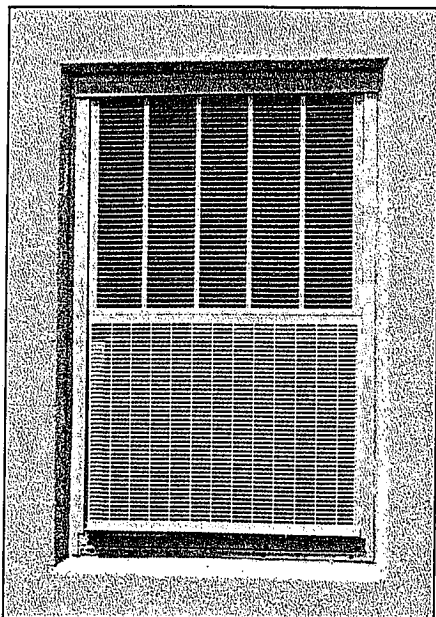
Recessed wall sleeve with enlarged and tapered-edge opening
